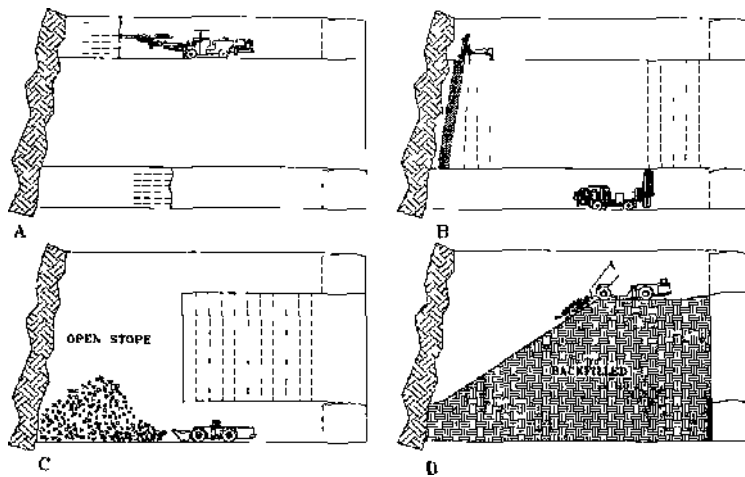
Mining method and mining cycle, a) development, b) drilling, c) blasting and mucking, d) backfilling
